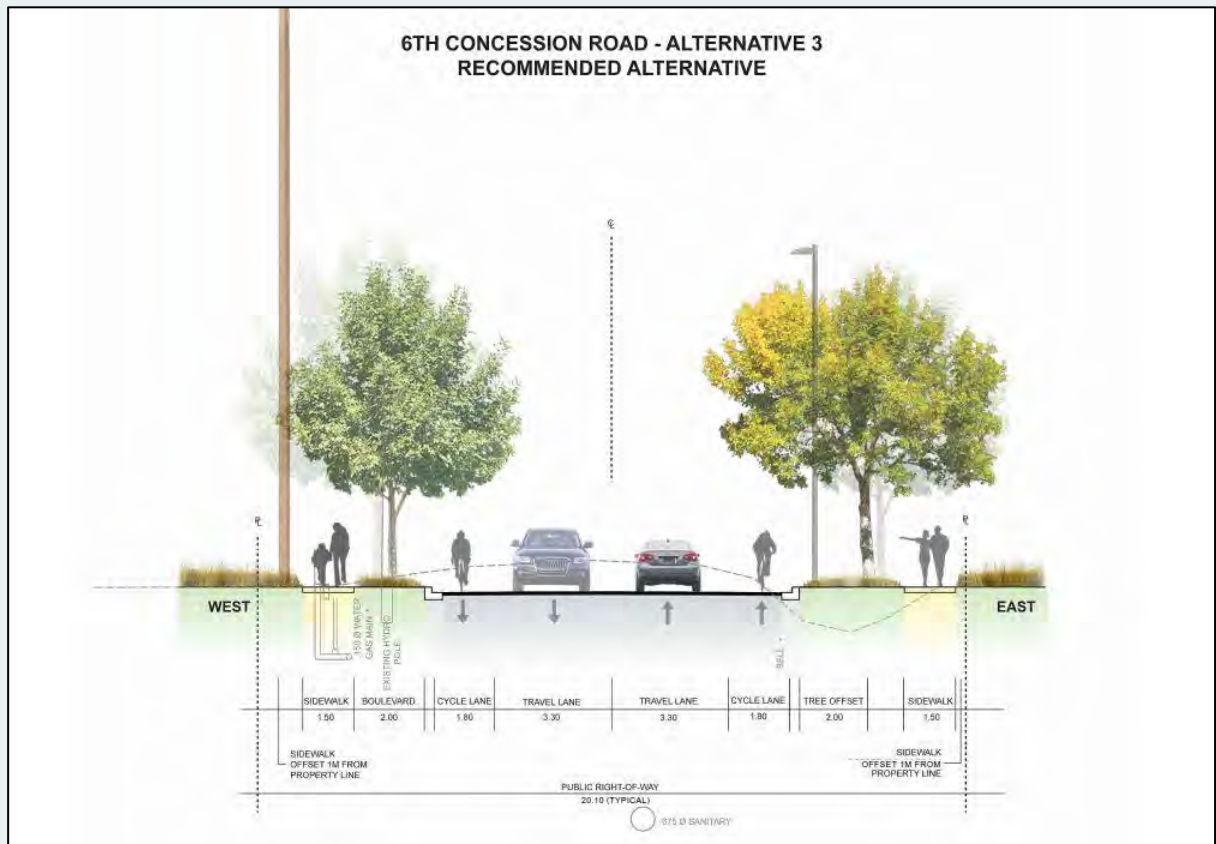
ALTERNATIVE 3 – SIXTH CONCESSION ROAD
